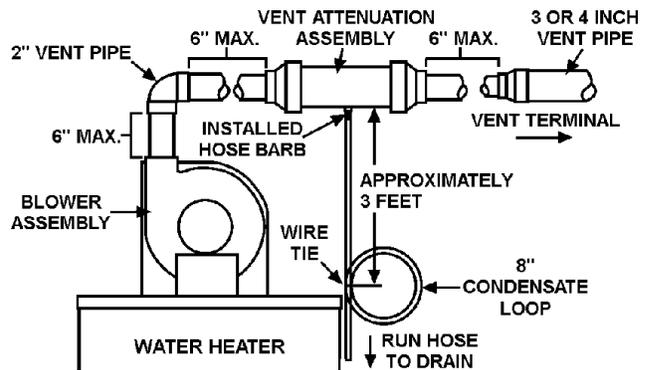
Typical Installation for Horizontal Vent with 3 or 4 inch
